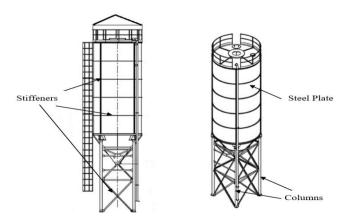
Elevation and 3-D view of typical silo structure
